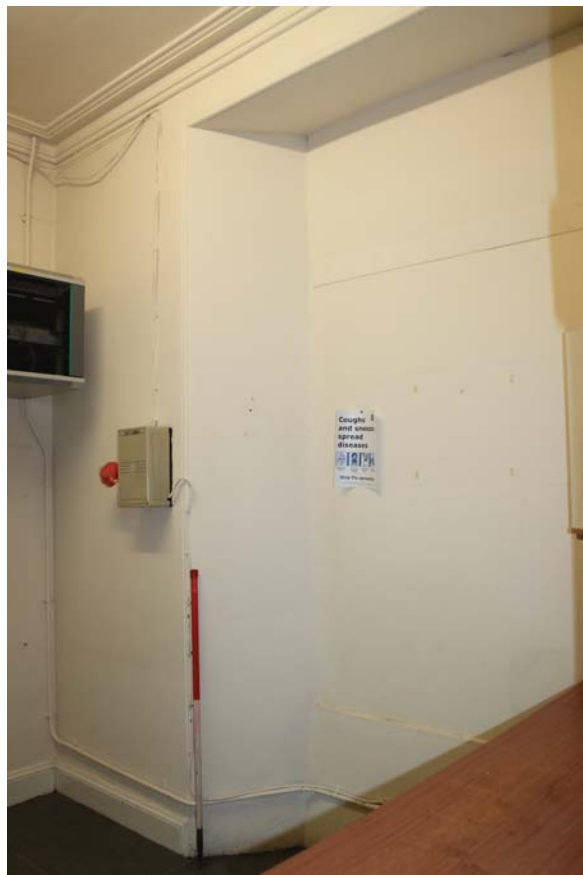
Room 0/5, detail of blocked opening in the south-west wall from the north
